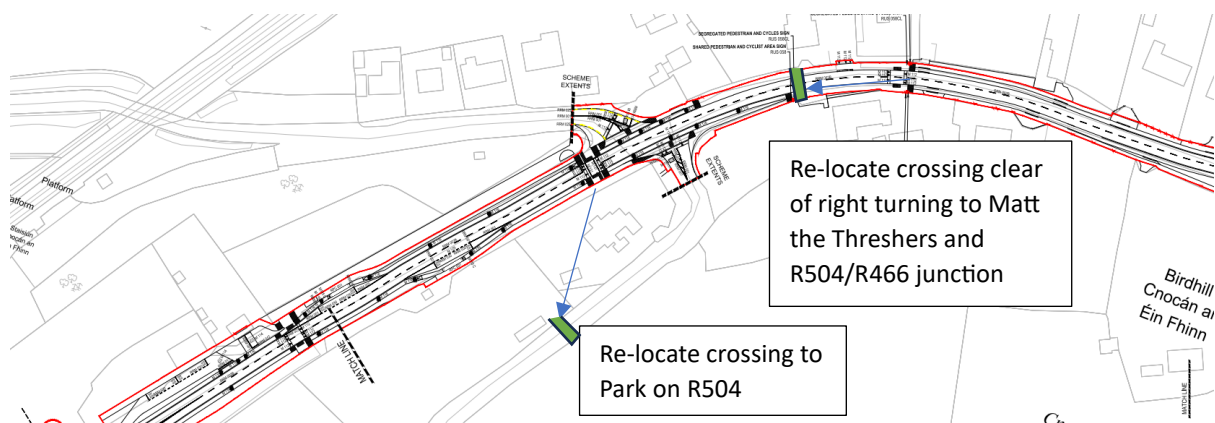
General Arrangement plan – suggested adjustment of crossing points to avoid right turning lane hazards
